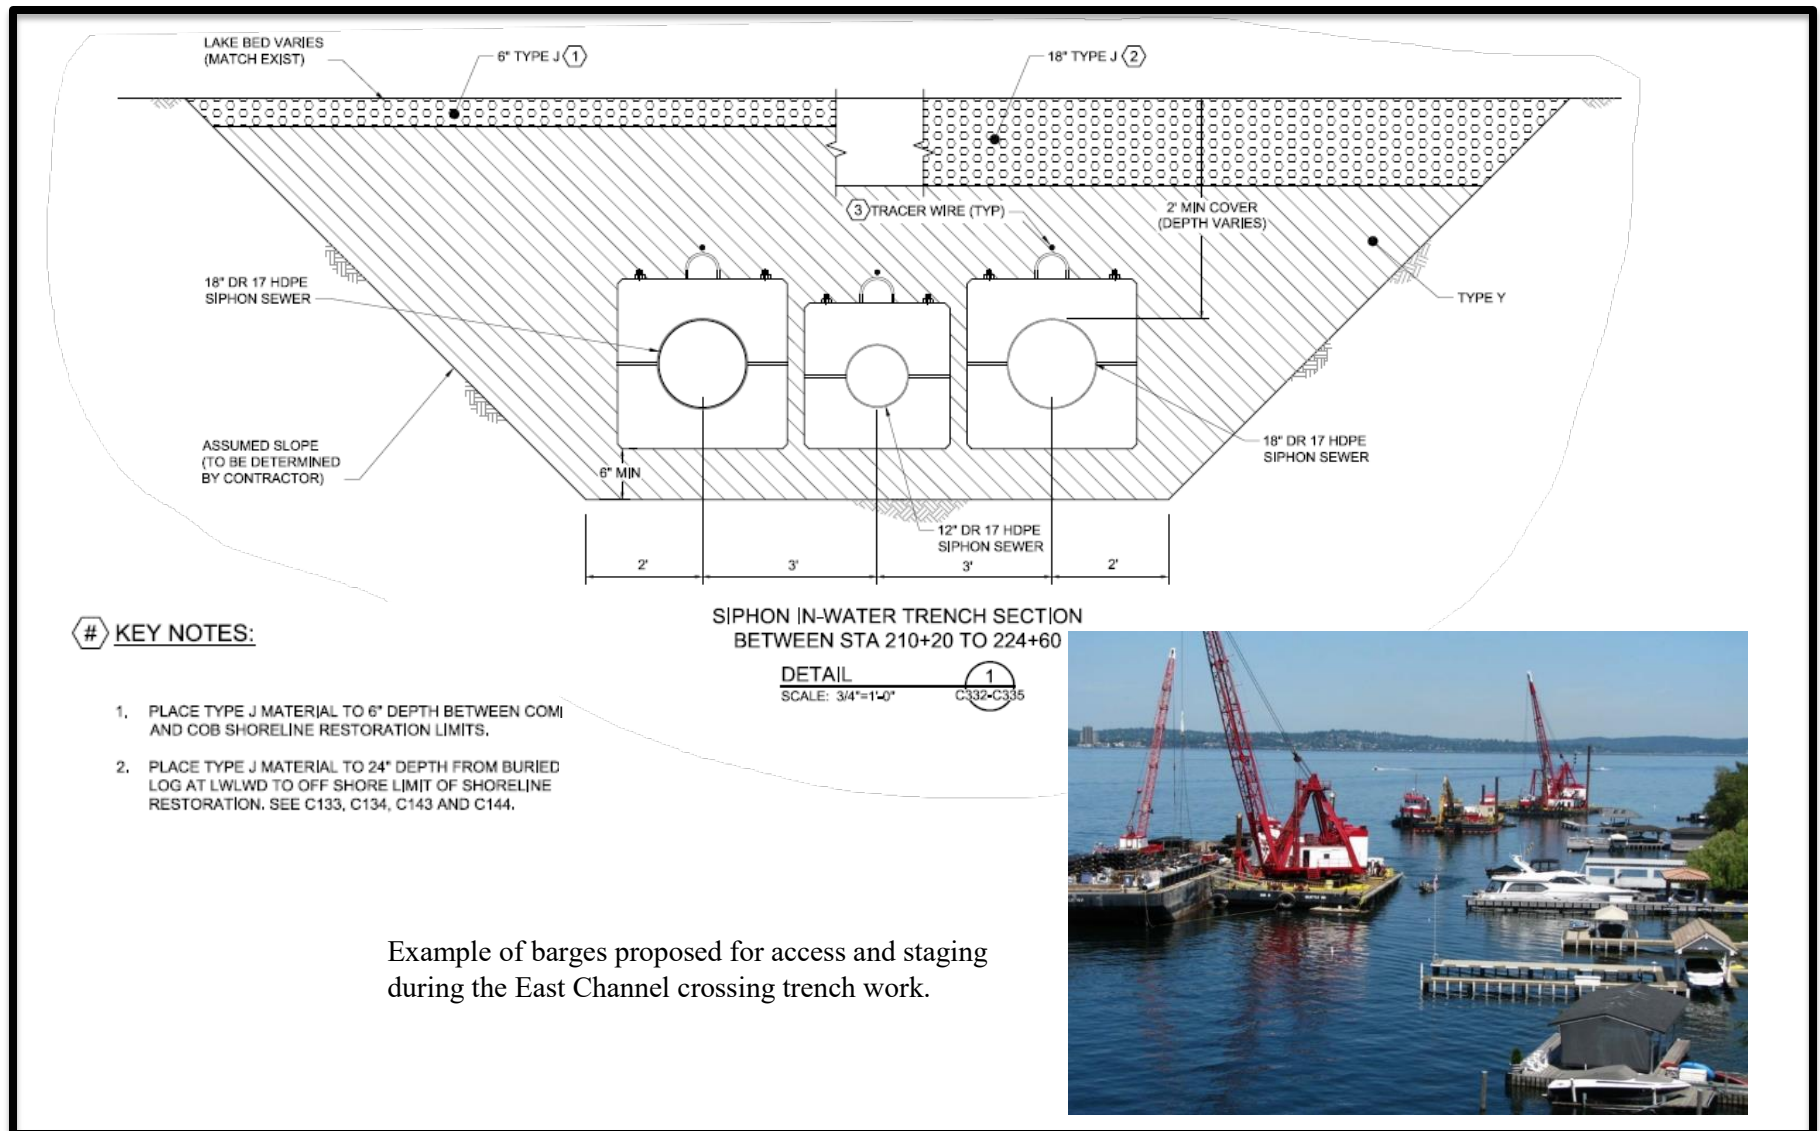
In-Water Trench Cross Section for the East Channel Crossing
